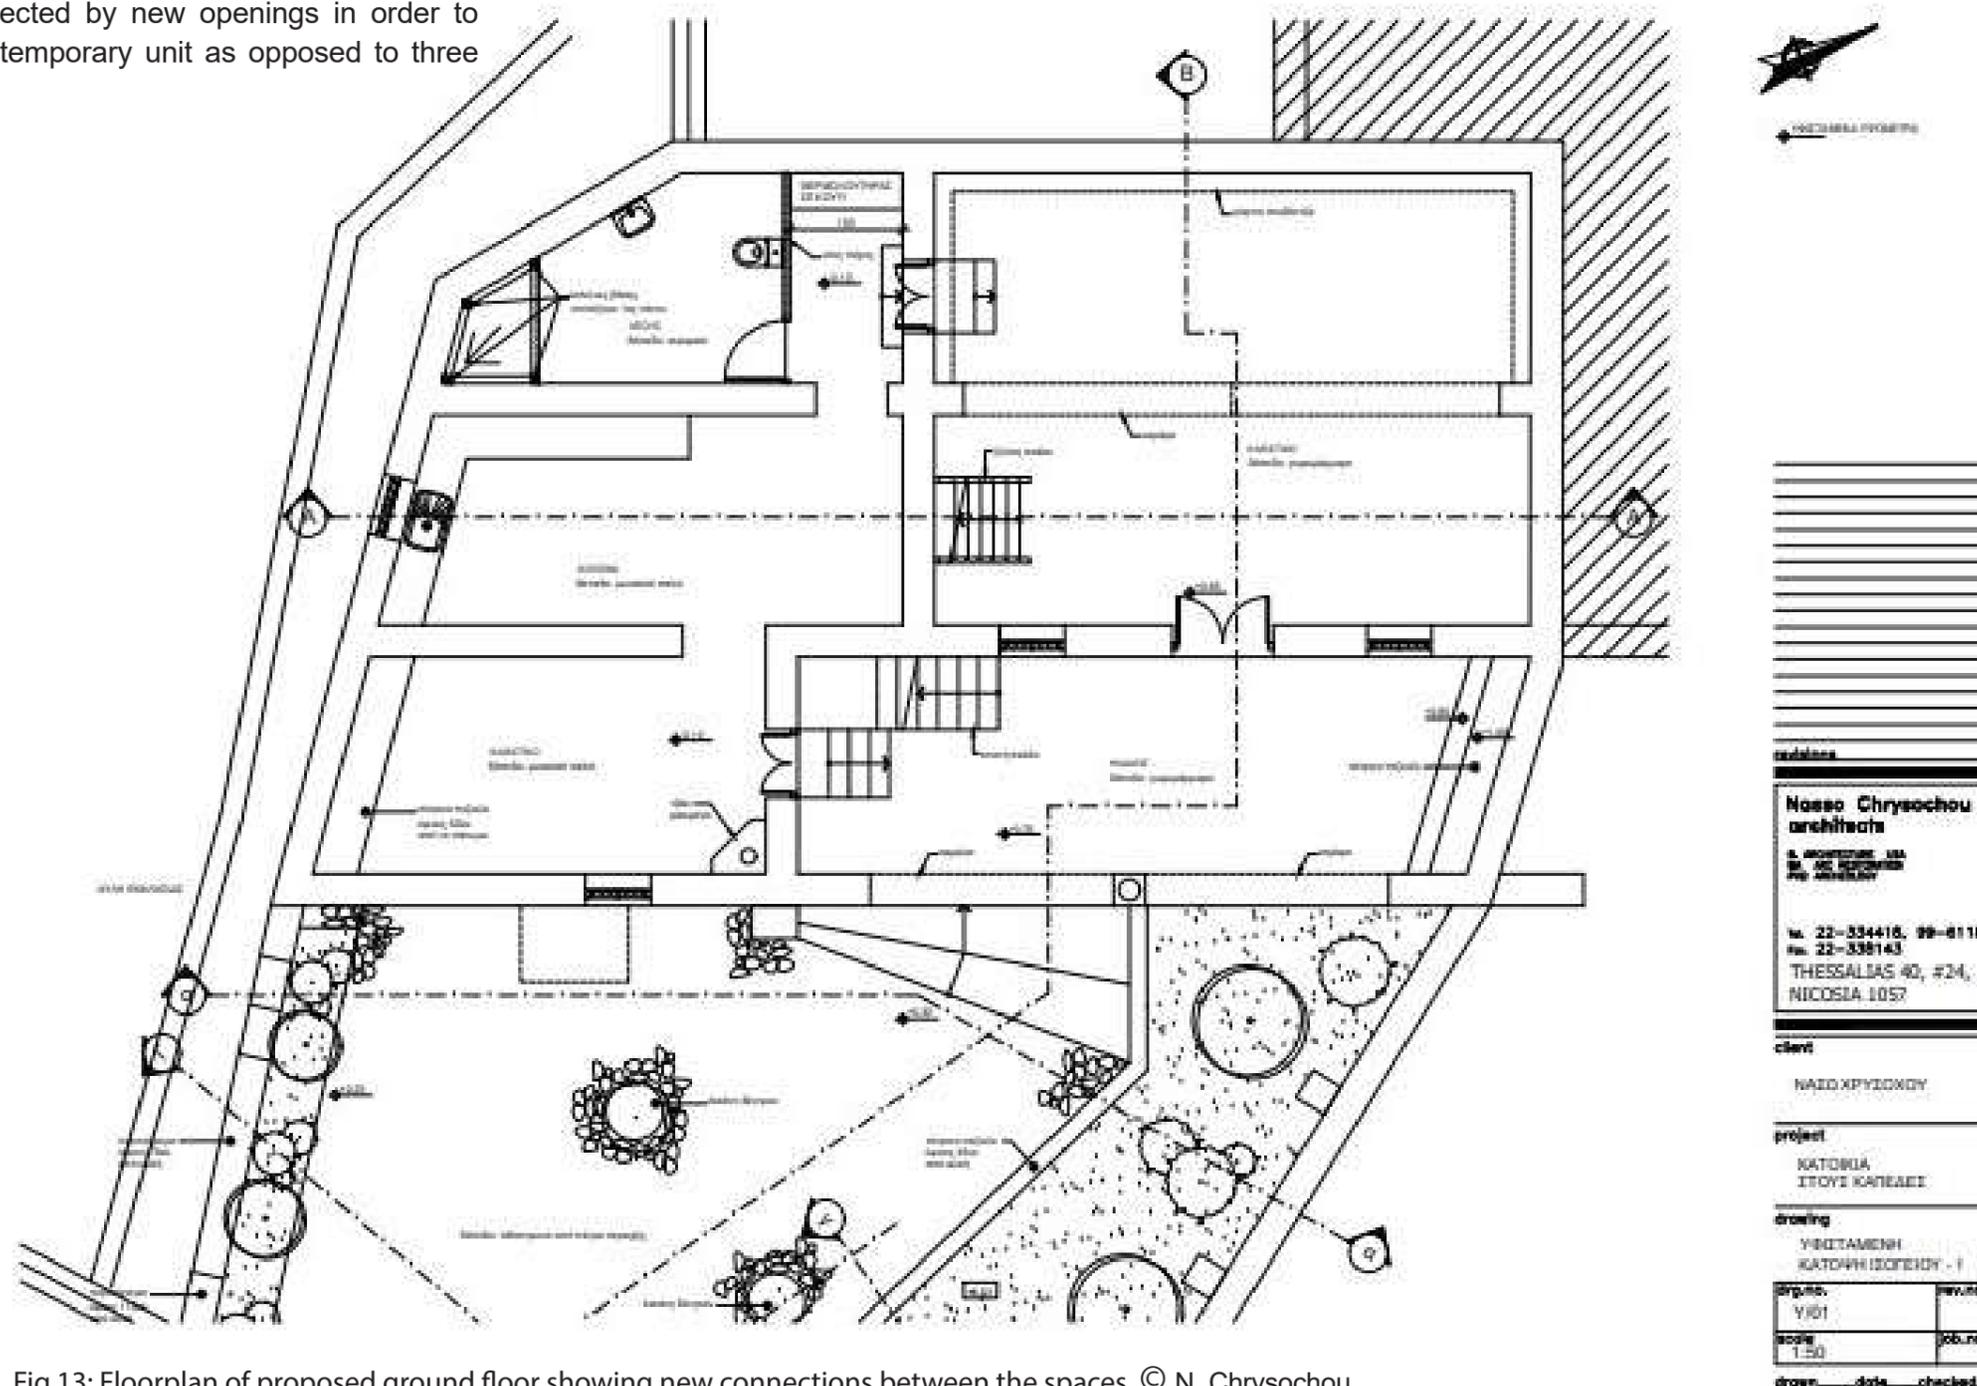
Floorplan of proposed ground floor showing new connections between the spaces. © N. Chrysochou
